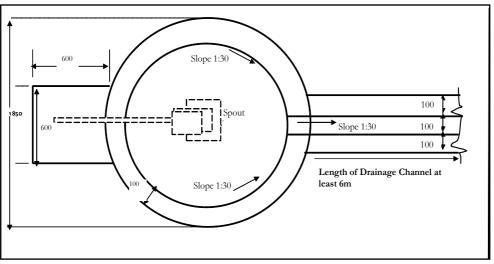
7: Drilled Well Platform Design Dimensions in mm
